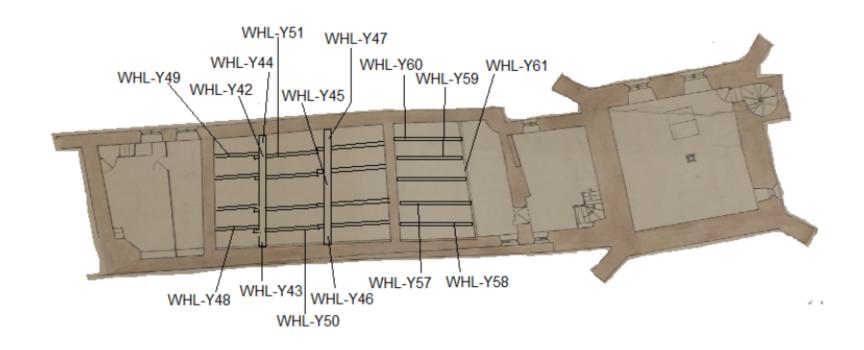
Plan of the north range, showing the location of samples WHL-Y42-51 and WHL-Y57-61 (Robert Martin, architect to Manchester Diocese (LA DRB acc 7633/37)
